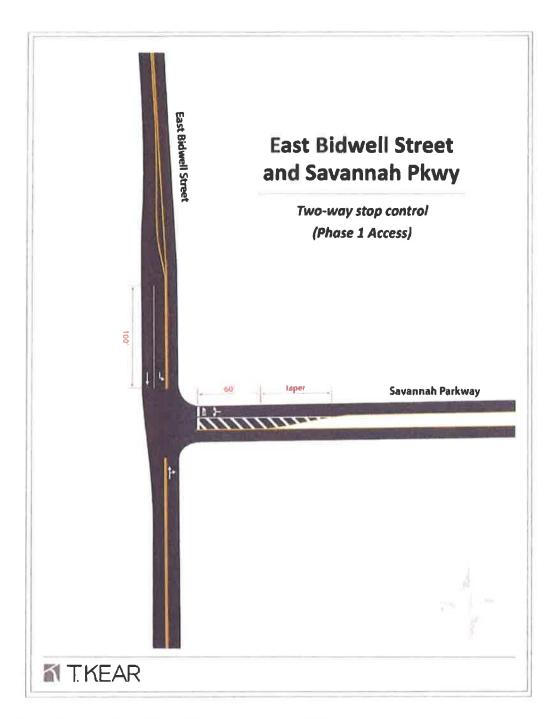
East Bidwell Street/Savannah Parkway TWSC
